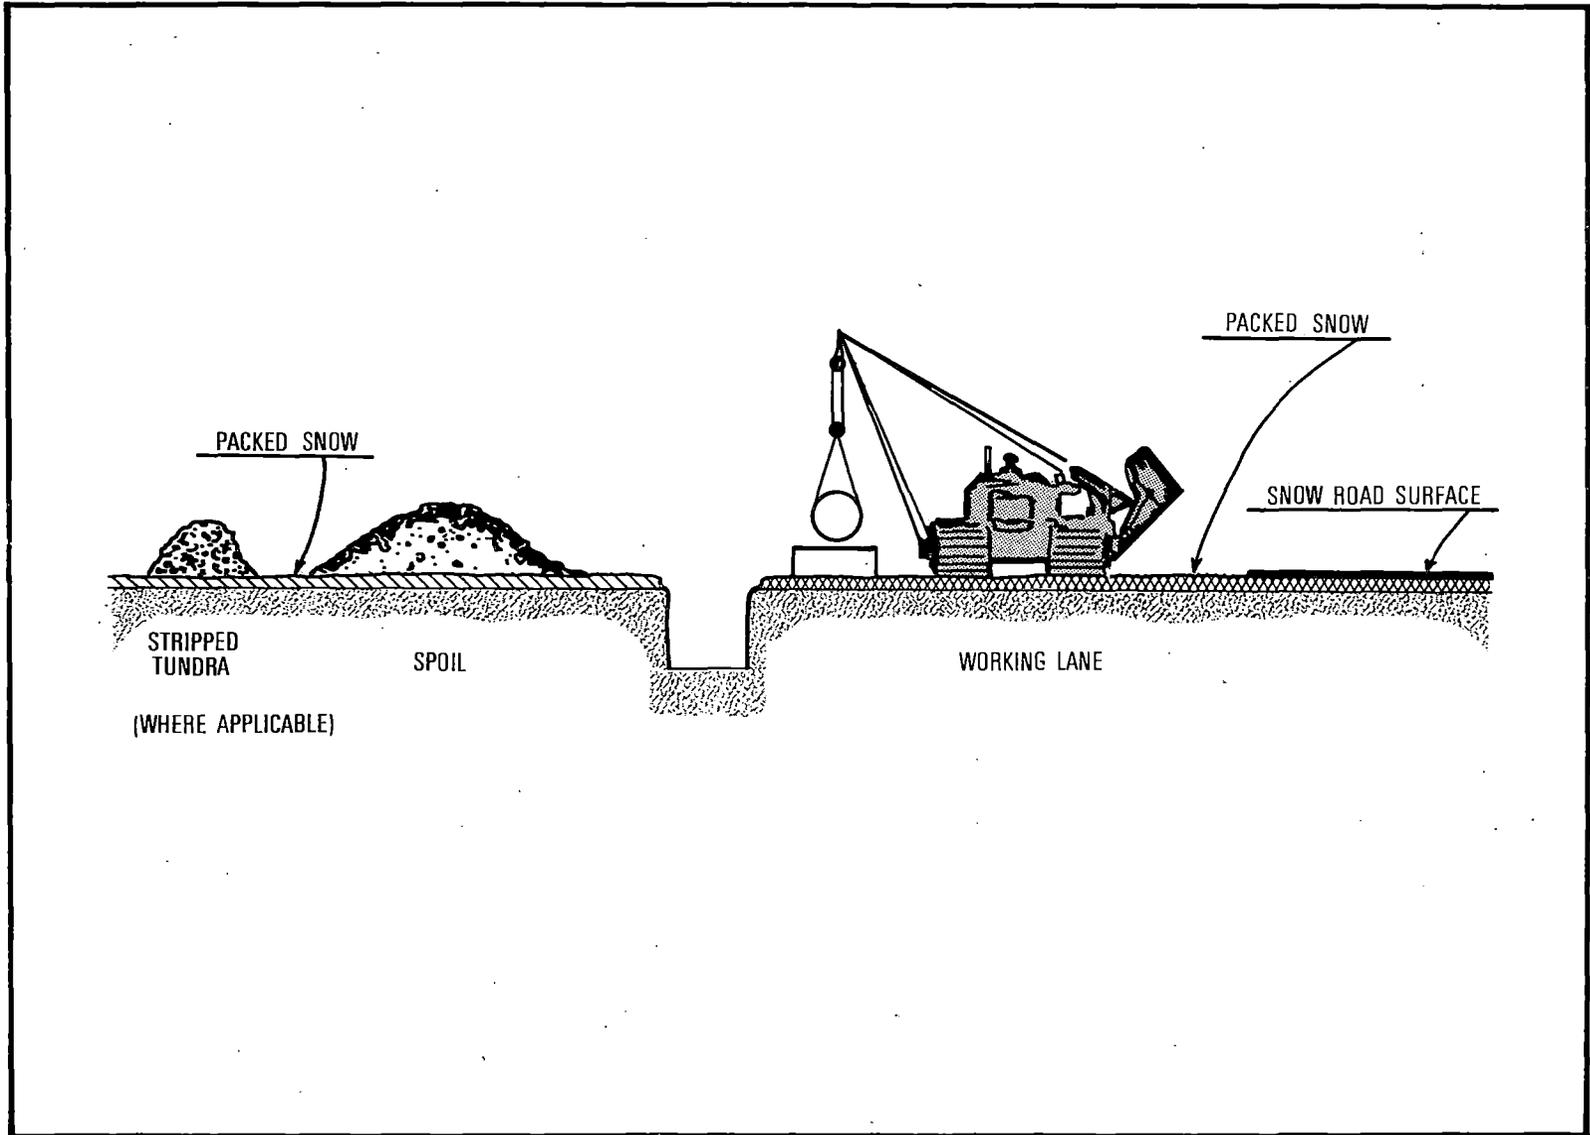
Cross section configuration of right-of-way
